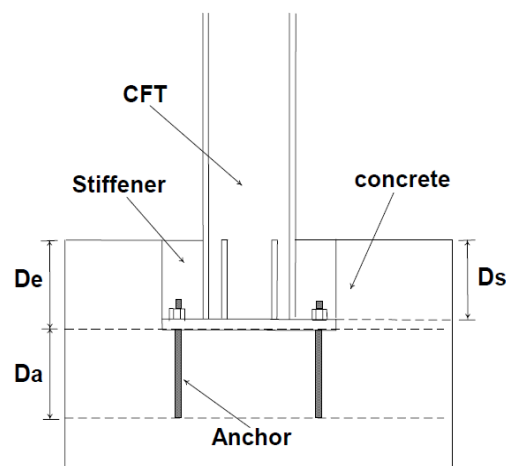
Connection detail of the base connection (Hsu et al., 2003).
